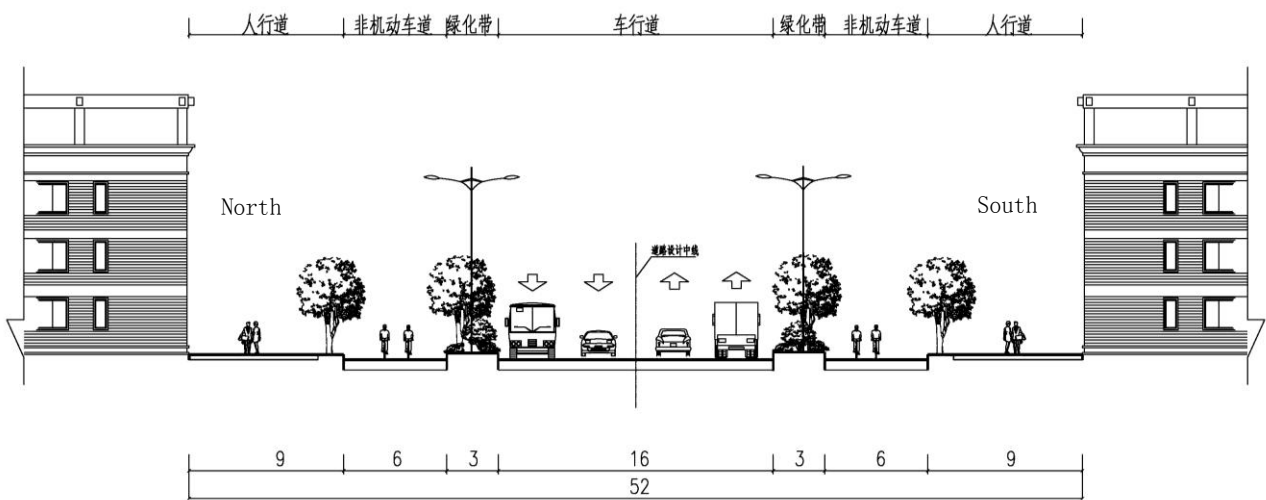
Sectional View of Existing Biyun Road (Hankou-Danjiangkou Railway ~ Jinqiu Avenue)
